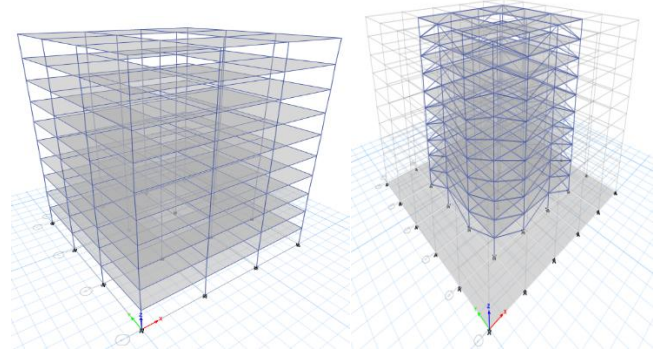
3-D view of vertical column building without and 3-D view of oblique column with podium
